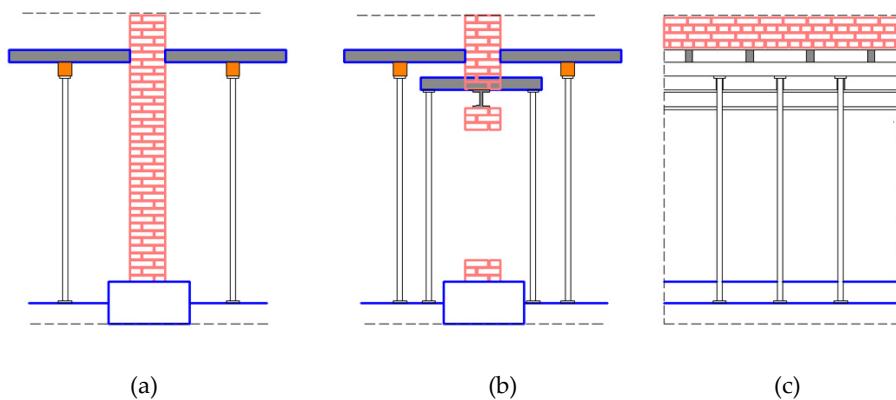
Demolition of a damaged URM wall and construction of a new wall: (a) scaffolding and formwork prepared for wall demolition; (b) setup for supporting upper portion of the wall, and (c) a side view of the arrangement for supporting upper portion of the wall.
